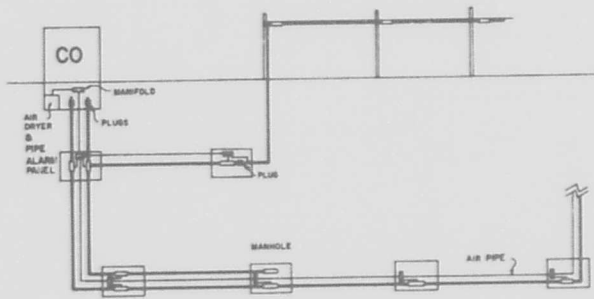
TYPICAL AIR PIPE SYSTEM
